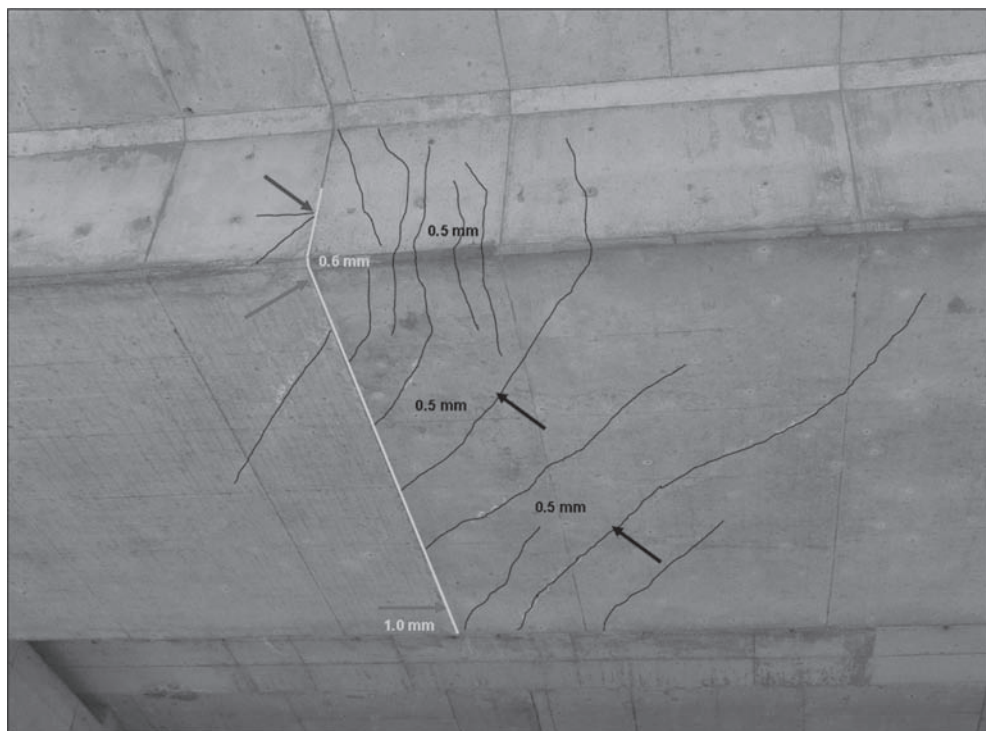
Cracking at location of coupling joint of pre-stressing cables.
